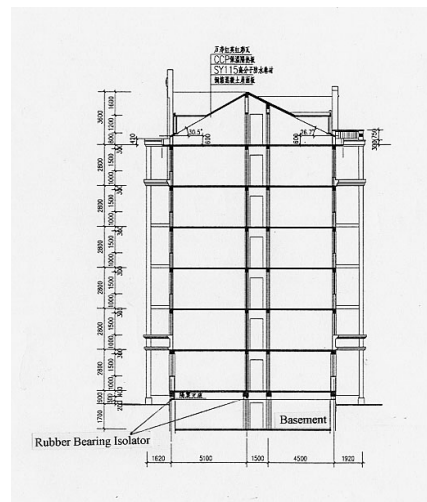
Building Elevation showing the Location of Base Isolation Devices
